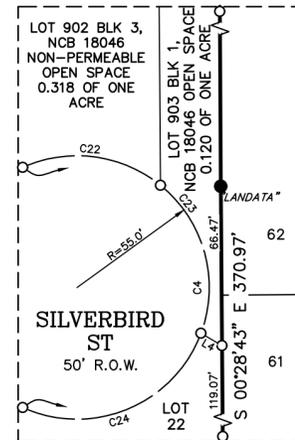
DETAIL "C" NOT TO SCALE SEE SHEET 2 OF 3
